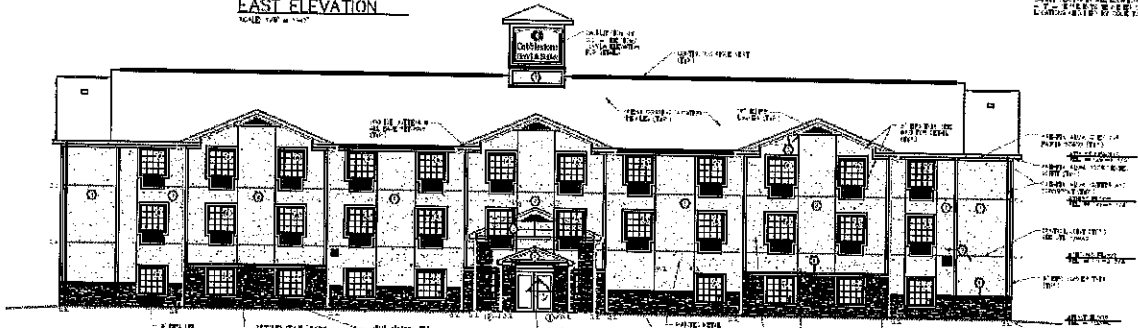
SITE PLANS AND RENDERINGS OF MINIMUM IMPROVEMENTS
